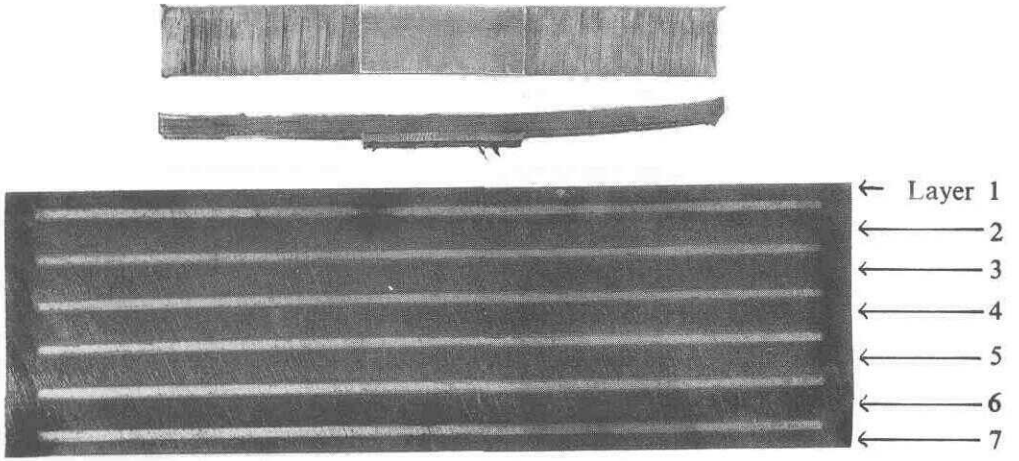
Cut rubber-bearing pad showing metal plates and bond strength testpiece (top).
